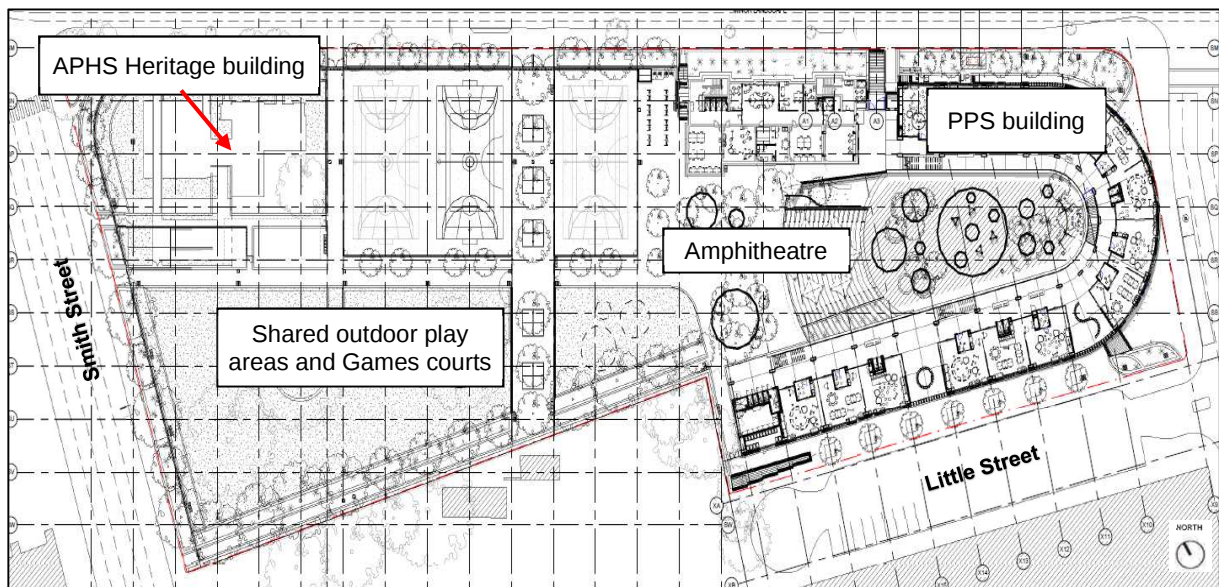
Approved PPS Ground Floor Plan (Source: DPE)
